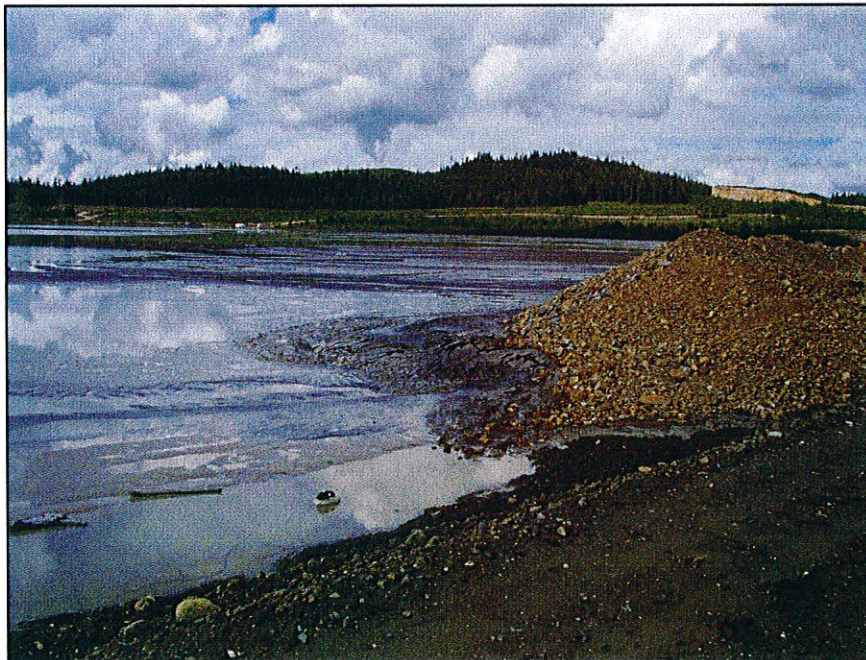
Geotextile placed on the Perimeter Embankment prior to placement of the shell zone.
